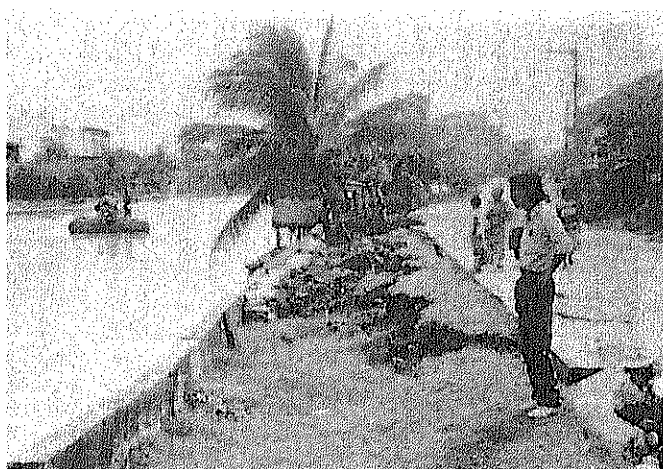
Damage to a parapet revetment in Dagupan city
